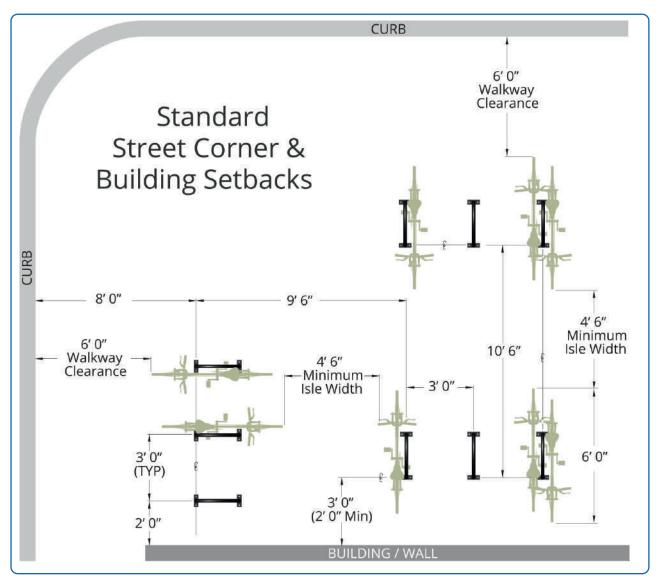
EXAMPLE BIKE PARKING AT STREET CORNERS (SOURCE: CYCLESAFE.COM)
